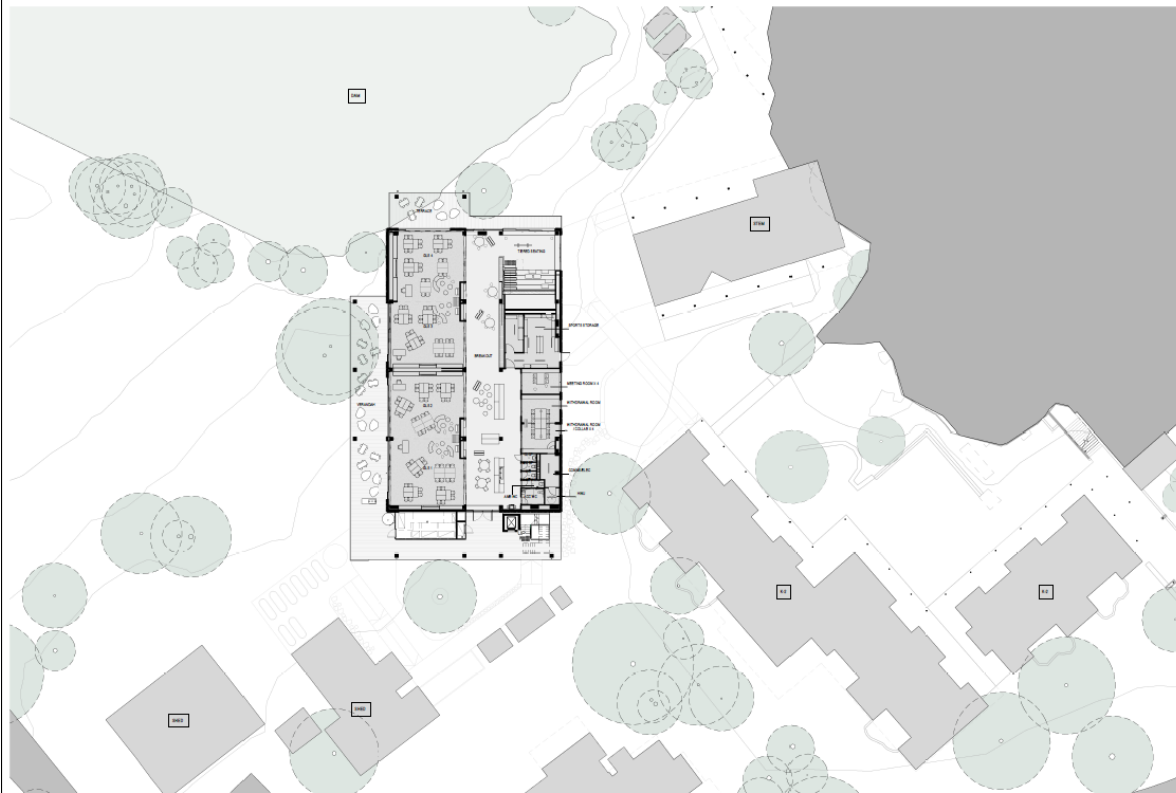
General Learning Unit – General Arrangement, Ground floor plan.
